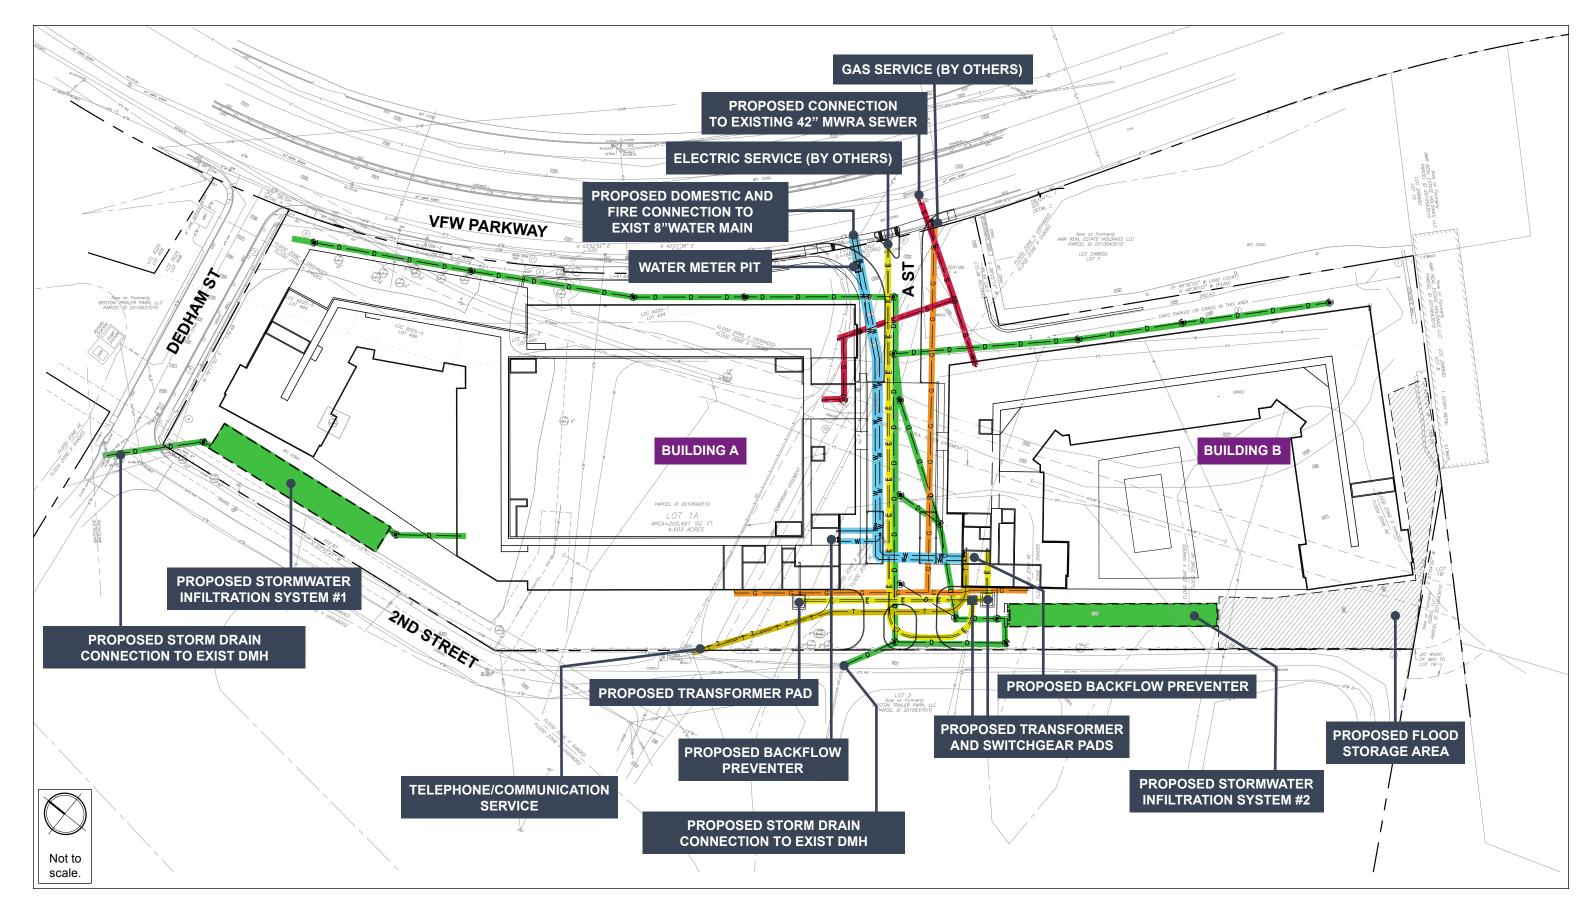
Site Utility Plan One connection to the water main is proposed for the fire protection services. The fire protection line will be split on-site to provide a fire protection service to each building. Additional hydrants may be required to provide proper fire protection coverage for the development. Additional hydrants, if needed, will be coordinated with BWSC and the Boston Fire Department during the design development phase of the project.
